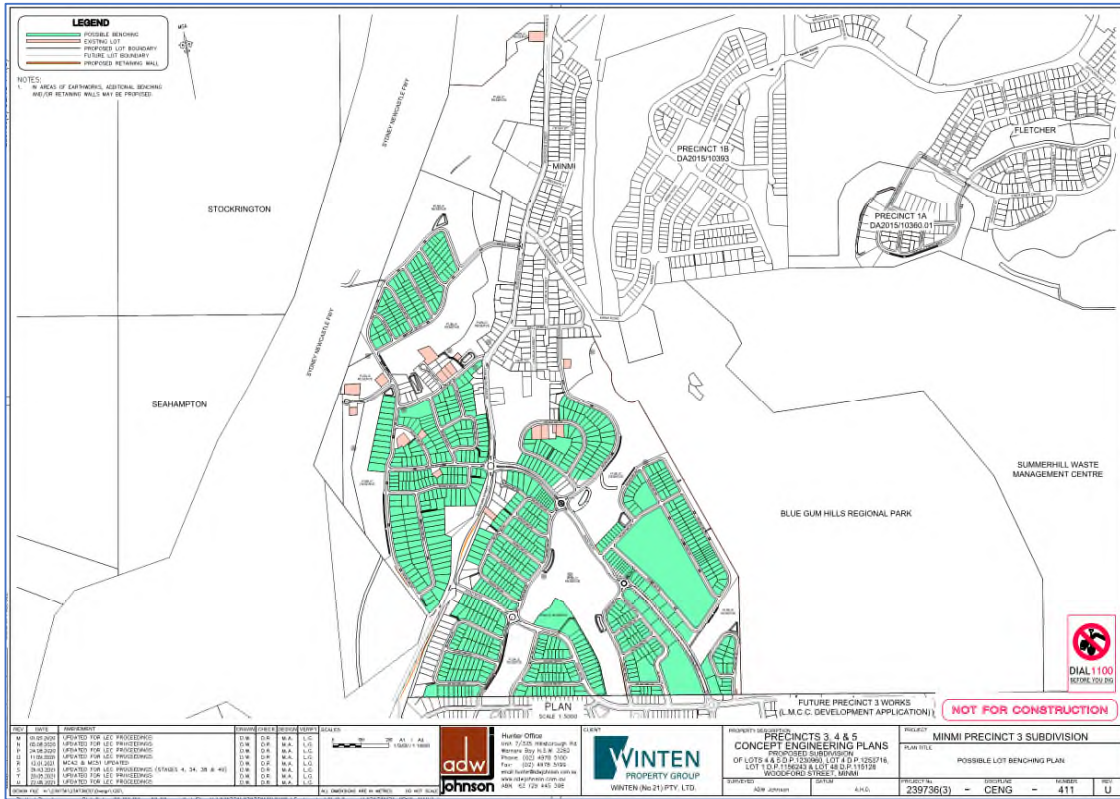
Extent of Lot Benching (Source – Concept Engineering Plan Sht 411)
